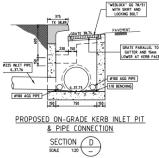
Extract of Section Details, kerb inlet and pipe connection (Source: Mance Arraj Engineers)
